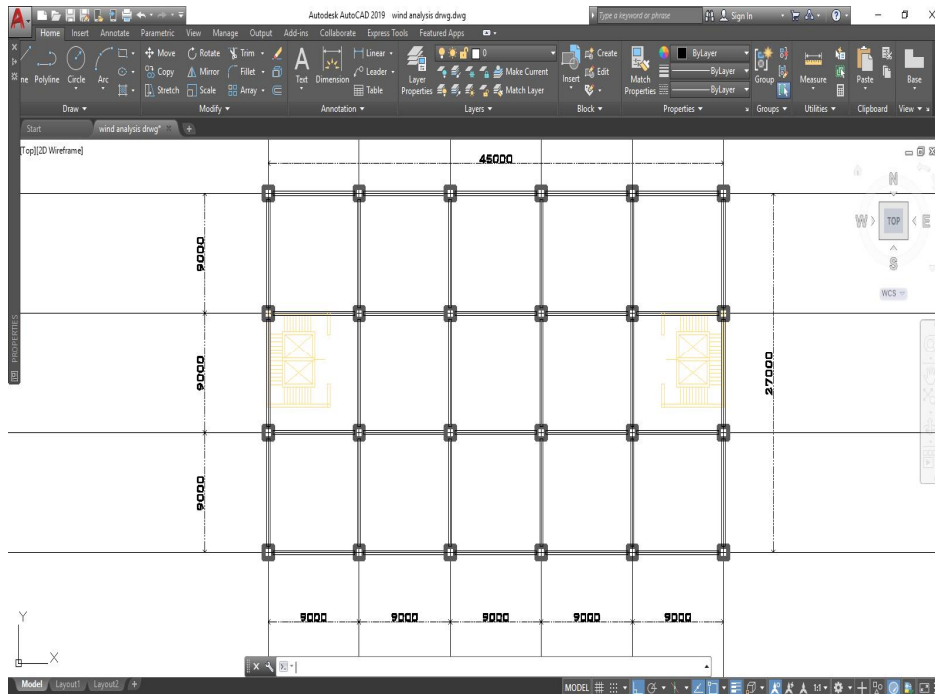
Plan view of 3x5 bay system with 9 mX9 m planar configuration
